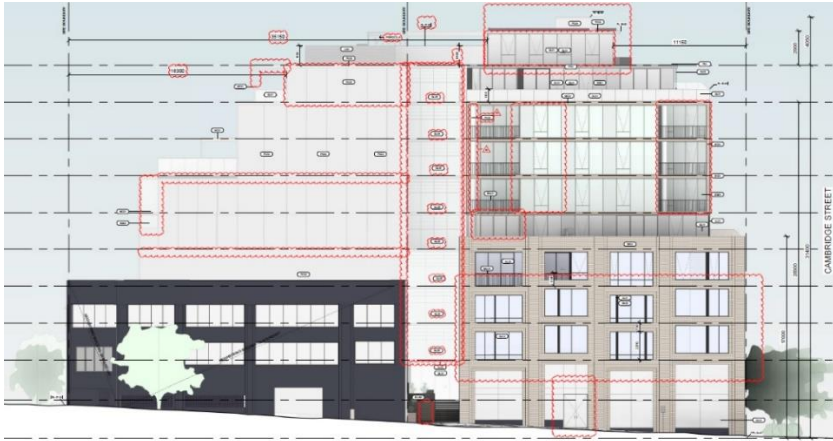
Langridge Street elevation of proposal approved pursuant to PLN18/0497
